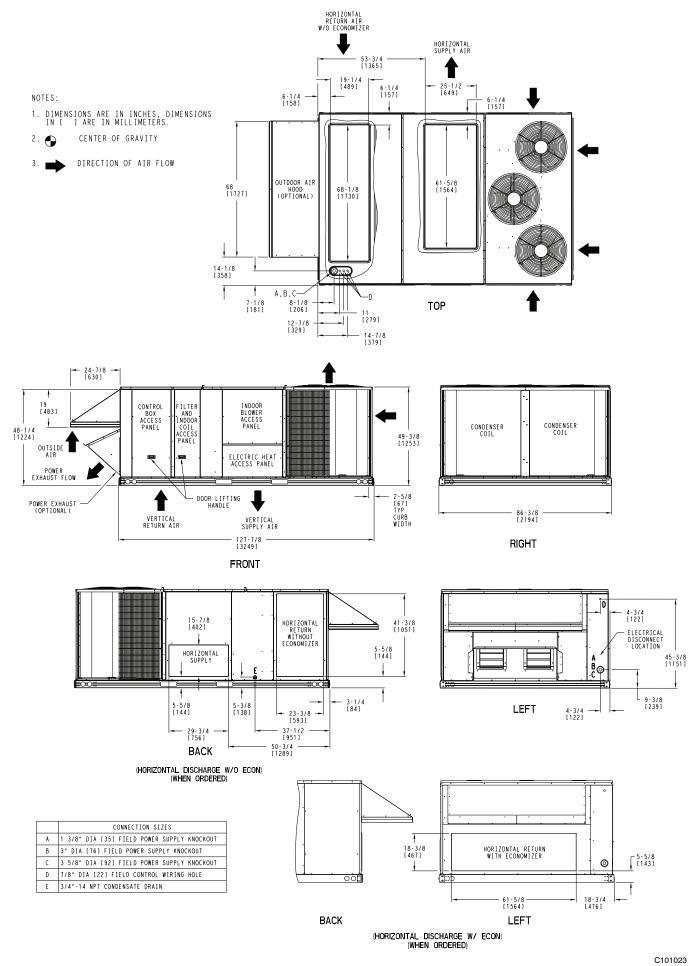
Unit Dimensional Drawing - 17 and 20 Size Units
